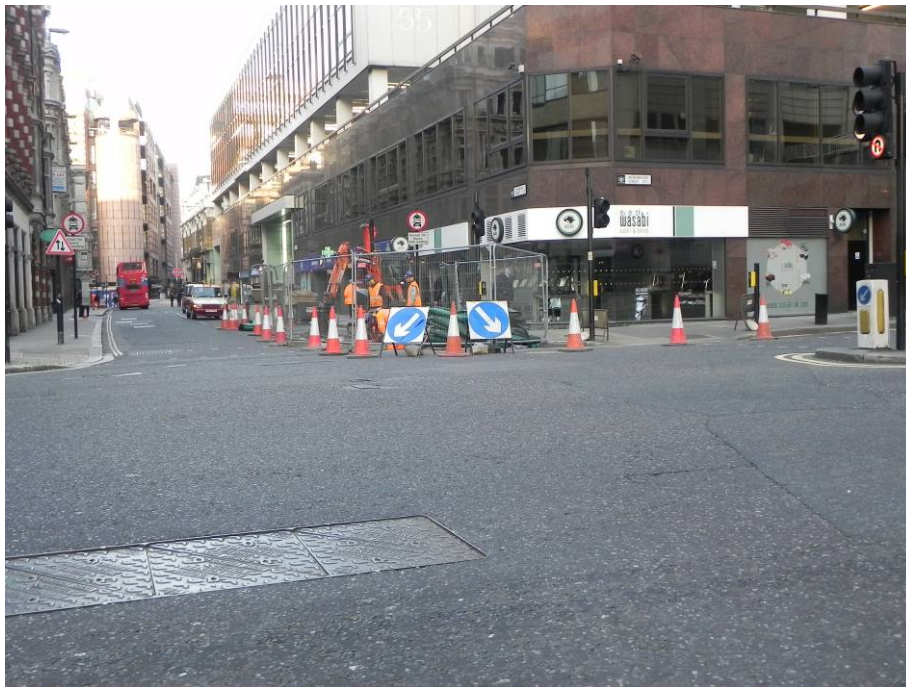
The southern end of the trench, at the junction of Old Broad Street and London Wall. Looking north-east.
